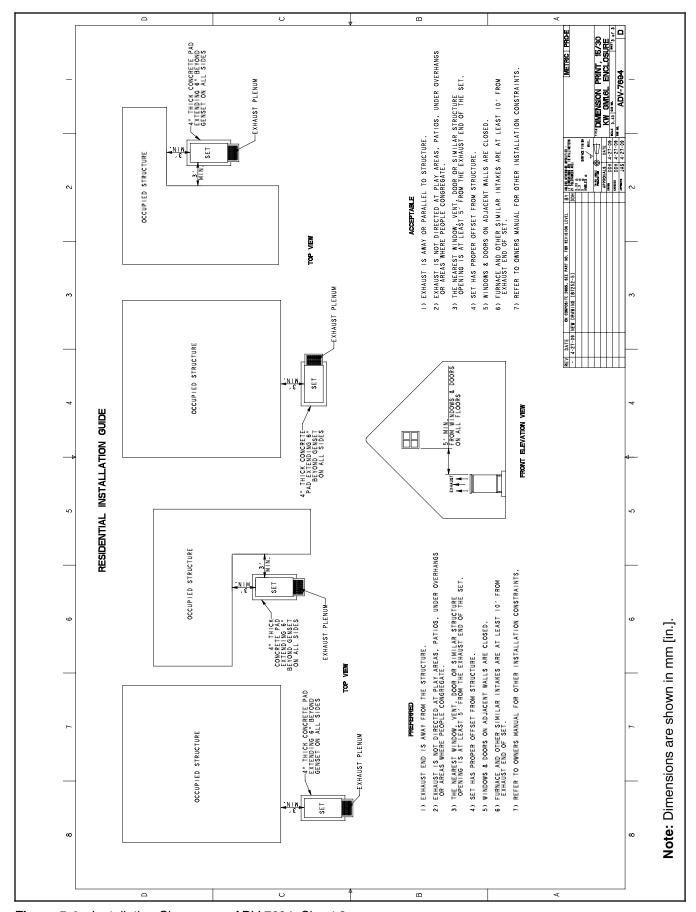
Installation Clearances, ADV-7694, Sheet 3
